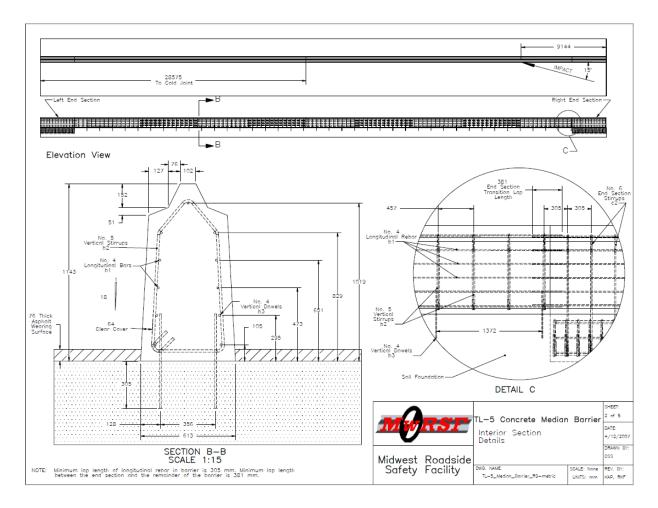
Layout detail, Test No. TL5CMB-2, reprinted from [16]
